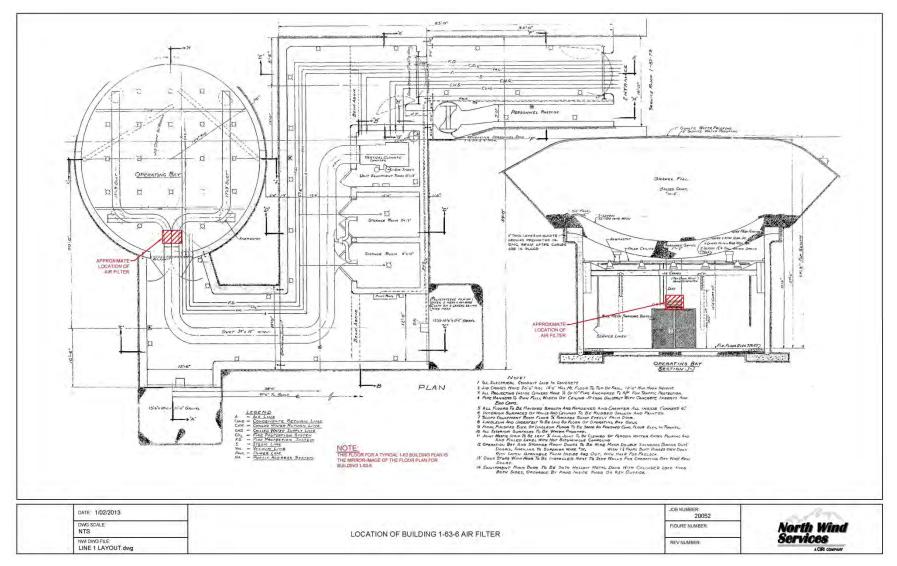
As-built floor plan for a generic 1-63 type building. The floor plan of Building 1-63-6 is the mirror image of the generic floor plan.
